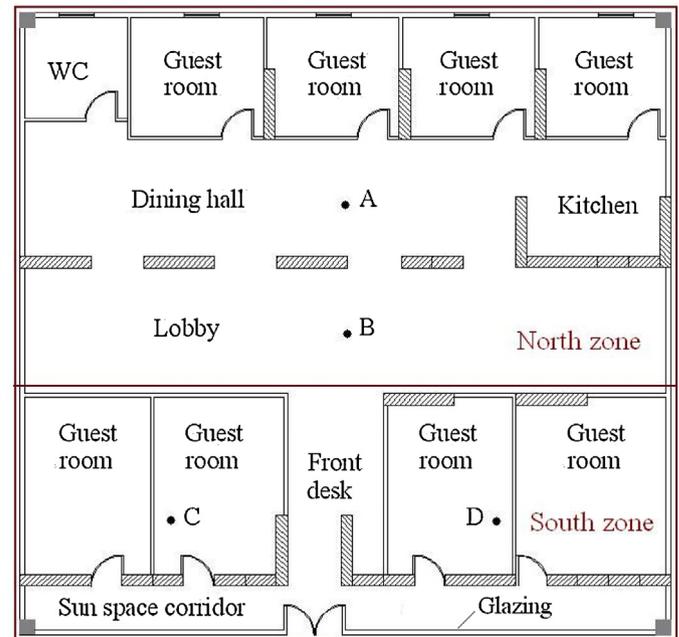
Floor plan of the passive solar house with water thermal storage wall.
